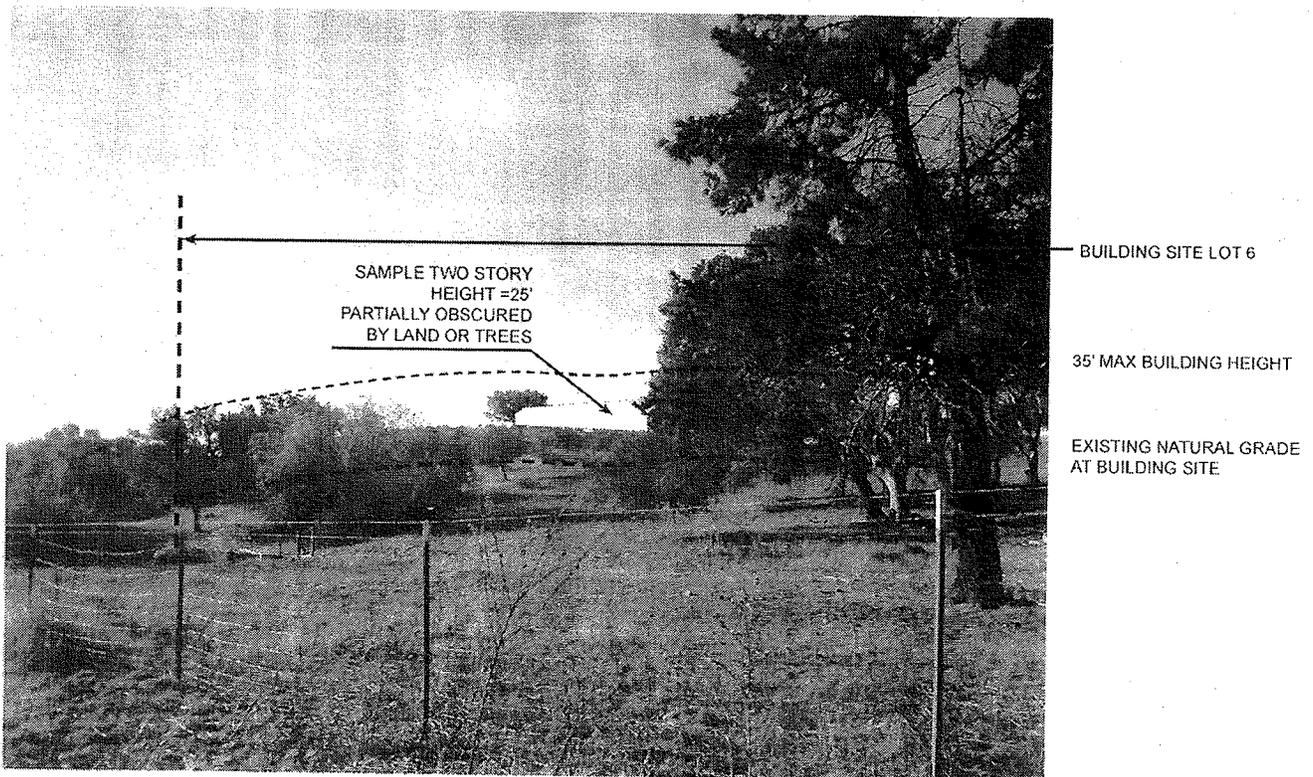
View Looking South From Old Oak Park Road (Project Site Is On The Right)
